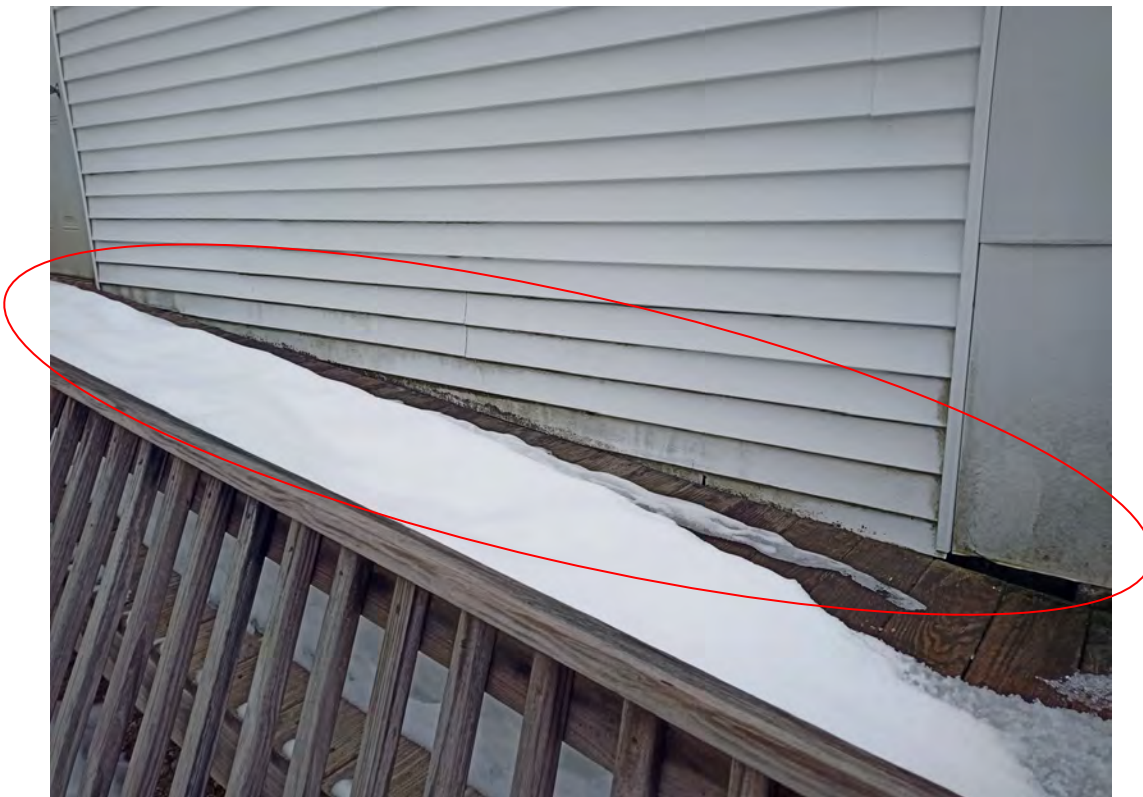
Accessible ramp butts up against building wall resulting in moisture accumulation, note staining
